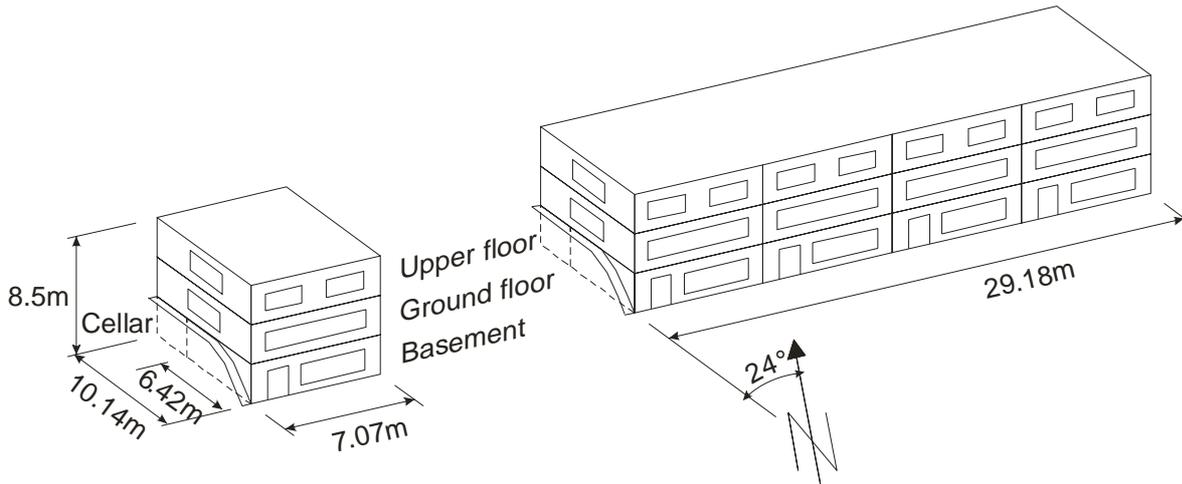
Geometry and orientation of SFH building (left) and MFH building (right).
